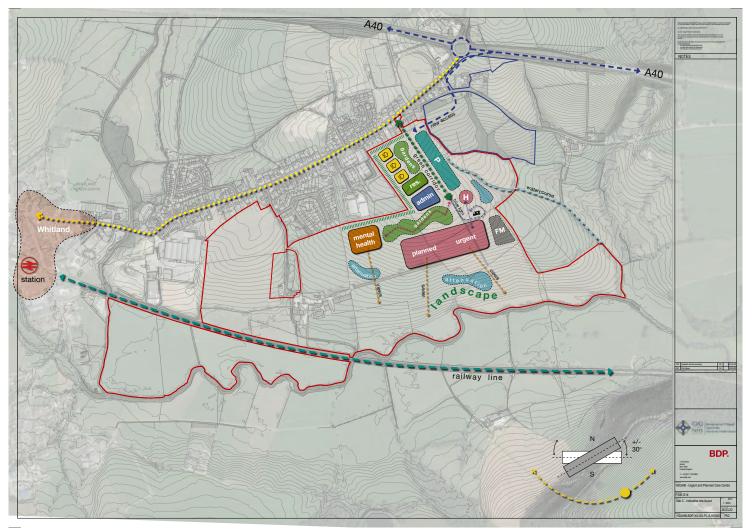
Indicative site layout showing the primary components of the proposed masterplan
